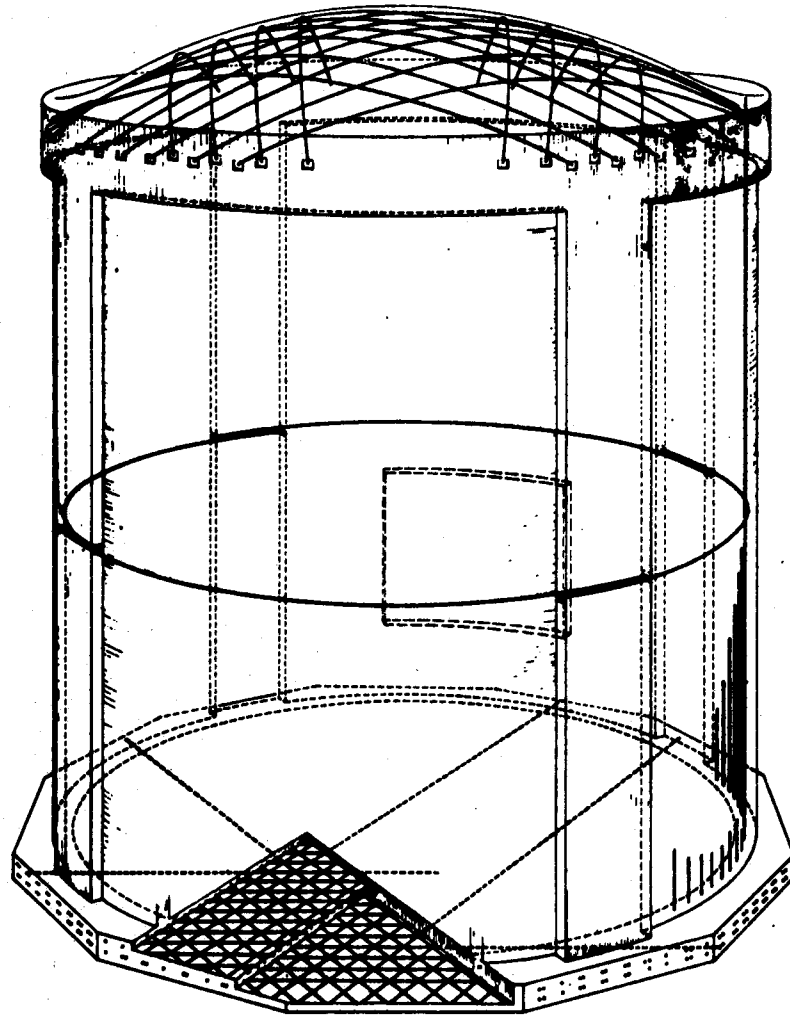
Reactor Building Prestressing Cable Arrangement
